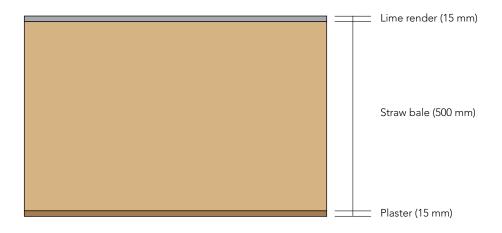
Plan view of a straw bale wall of standard bale thickness, U-value 0.15 W/m².K
